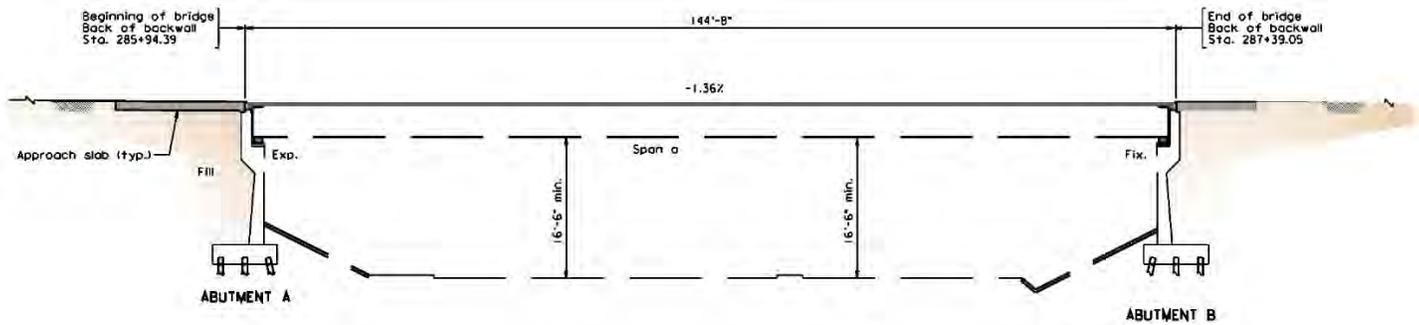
Elevation Section - I-81 Over Thompson Memorial Drive
